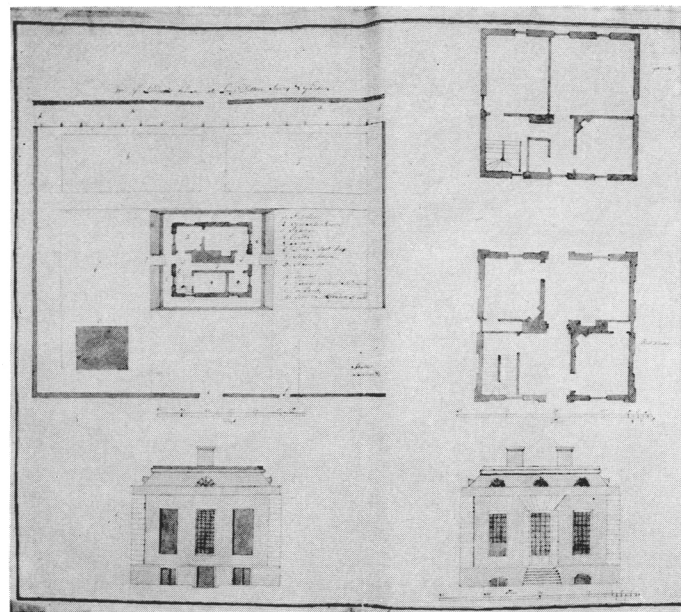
'Mr G. London's house at Long Ditton Surry & Garden'* [51]
